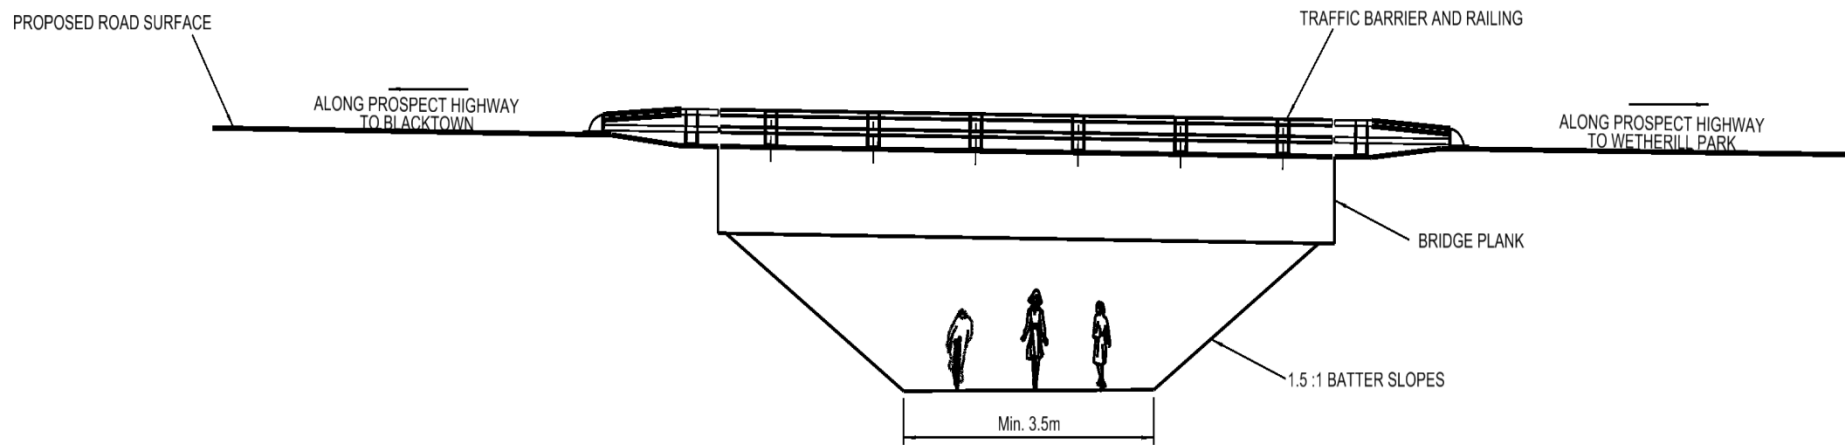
Typical section of upgraded Old Church Lane to Keyne Street pedestrian underpass
